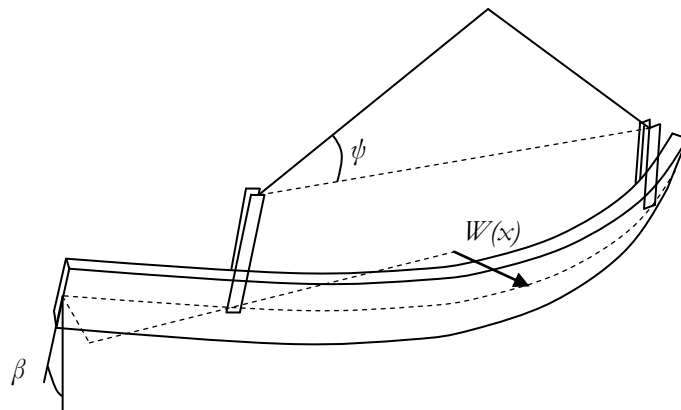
28 Buckling mode of a typical beam hanging from inclined cables showing the parameters used to define its shape. ^[19]
